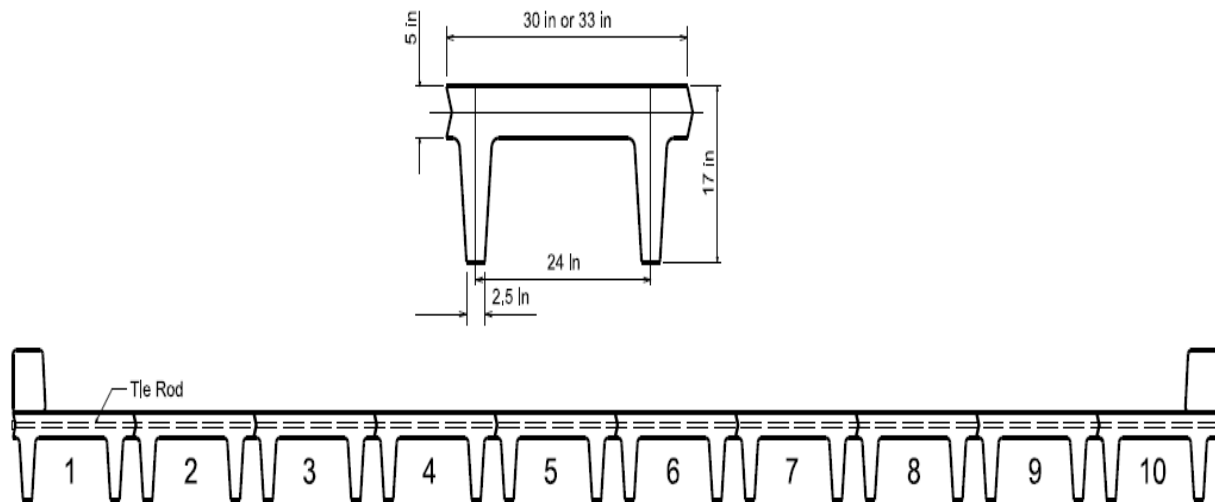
Typical cross section of a single channel section and the entire bridge deck.
